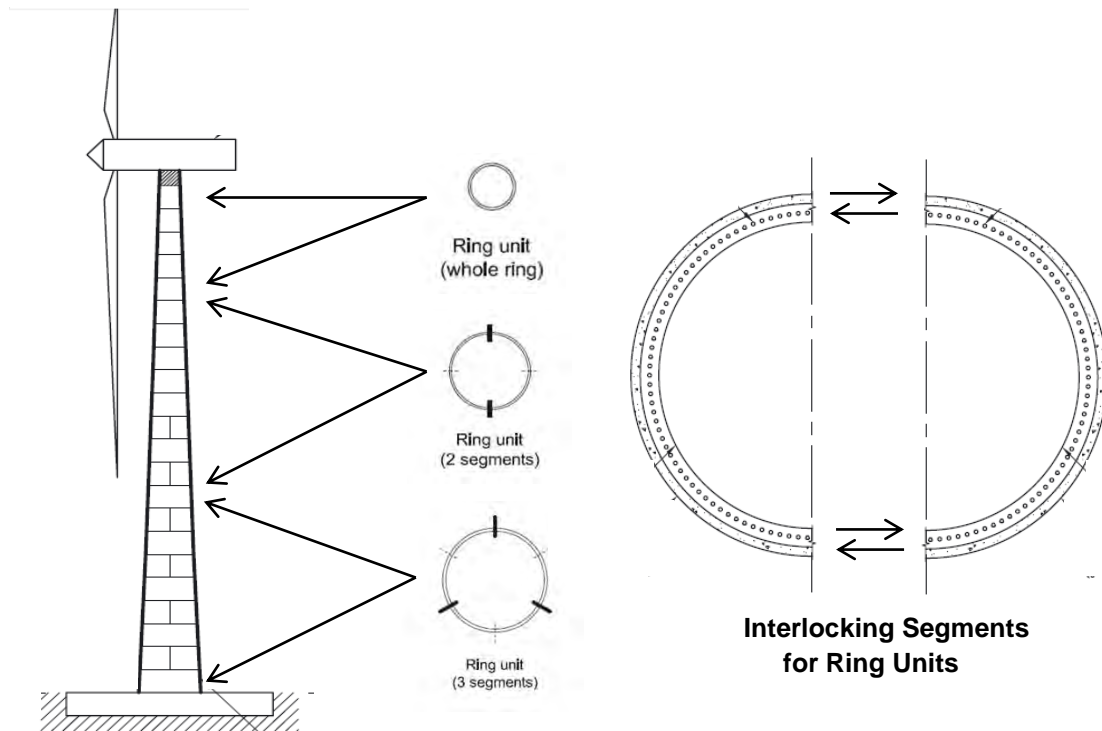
Construction of a precast concrete onshore HAWT tower
